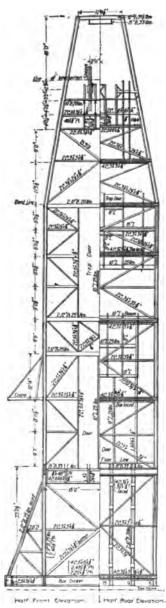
Steel Shaft House for Sibley Mine, Rear Elevation.
